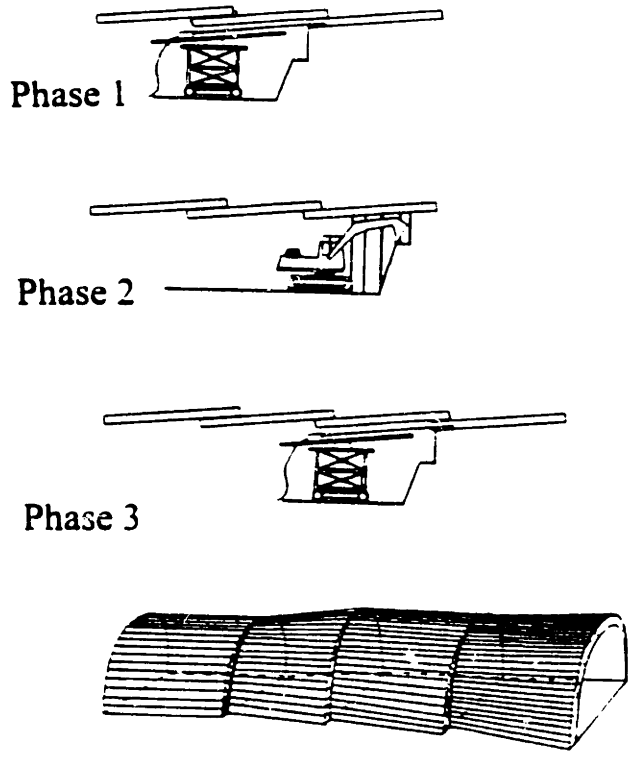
Construction sequences of the sub-horizontal jet-grouting method
